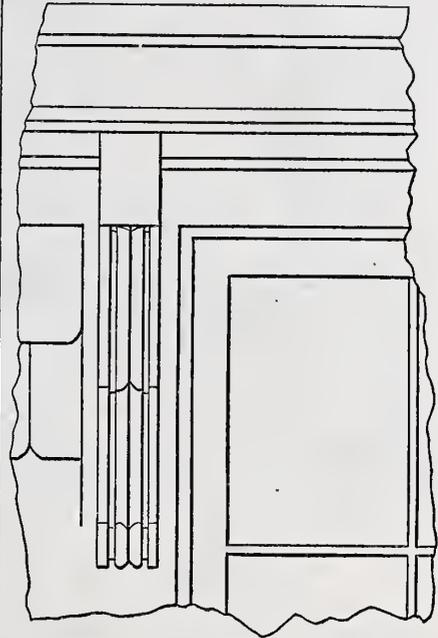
Elevation of Molding and Face of Bracket in Finish of End Elevation.—Scale, 1 1/2 Inches to the Foot.
